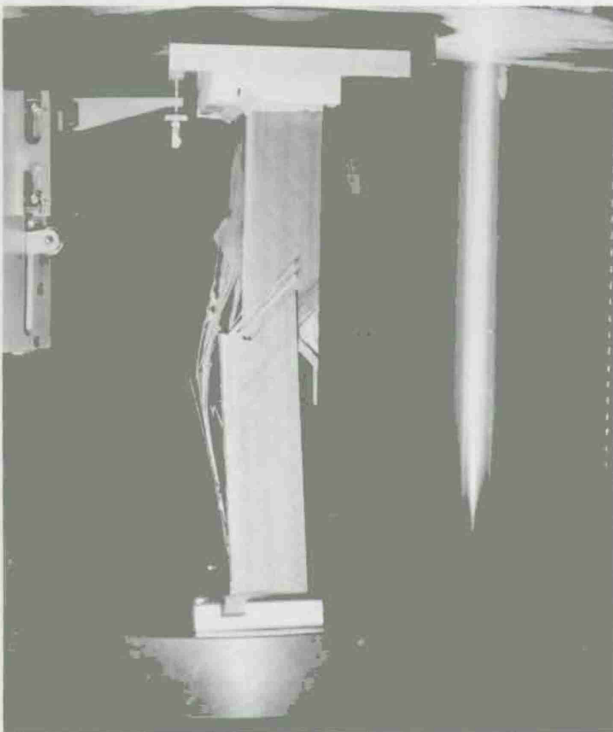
Ultimate compressive failure of channel specimen 24-1 at 27,600-lb load.
